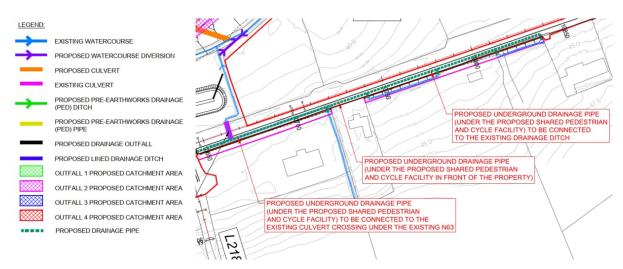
Extract from Appendix C – Additional Drainage Detail at Rose Villa
